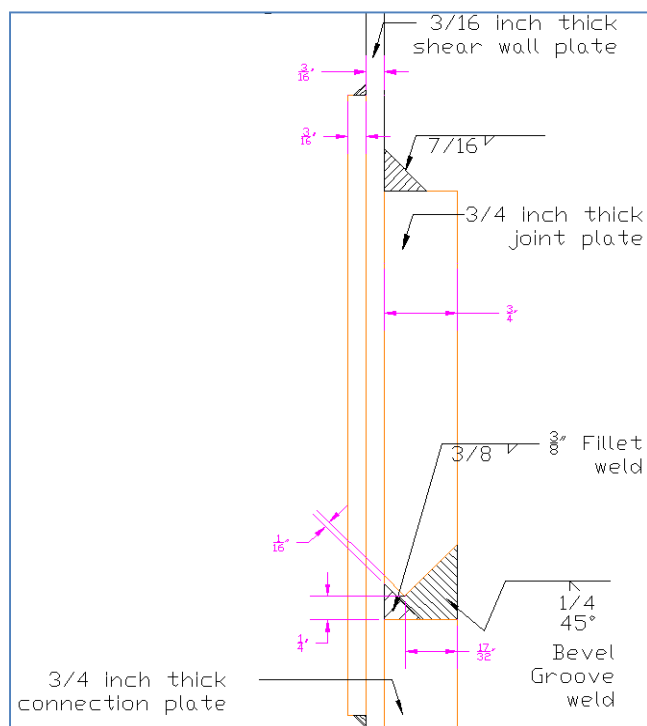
Weld Joint 2 - A 3/8-in. fillet weld and bevel groove weld in addition to the 7/16-in. fillet weld
